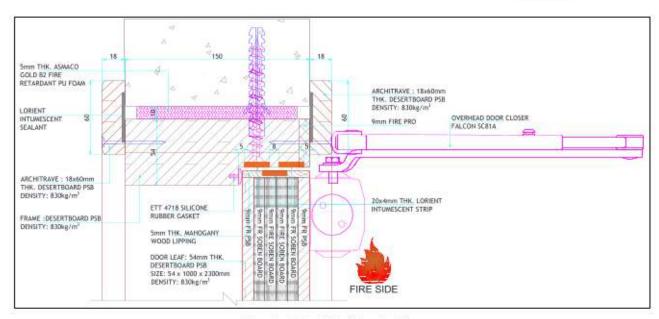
Horizontal section view of the doorset A. (Drawing provided by the test sponsor)
